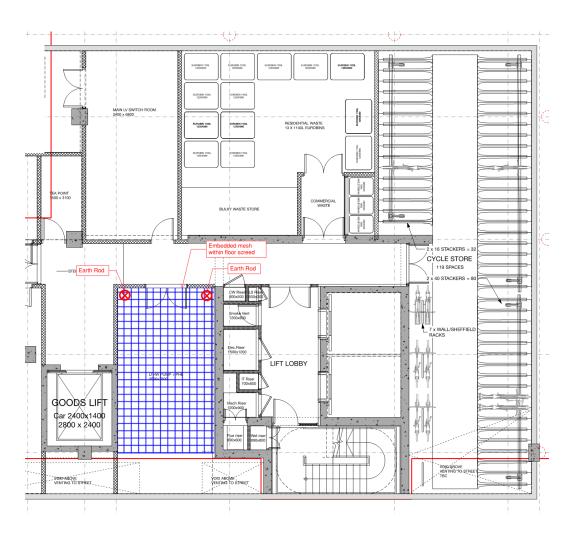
Proposed Earthing Arrangement beneath UKPN Sub-Station
